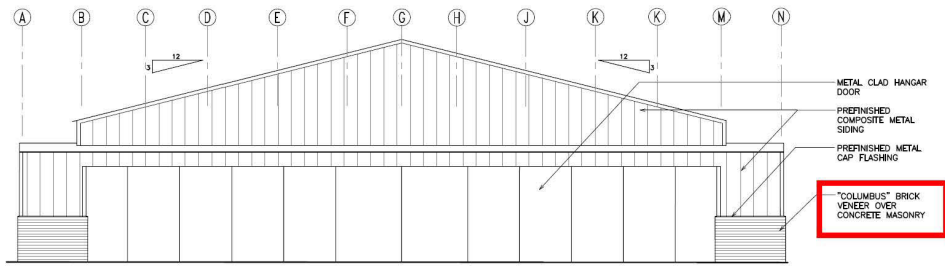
Image showing the proposed hangar door configuration, which shows the doors being retained in place. The note indicated in red, which is shown on the 35 percent design plans, indicated that brick veneer would be installed; however, that design element has been removed to avoid impacts to the historic property.
